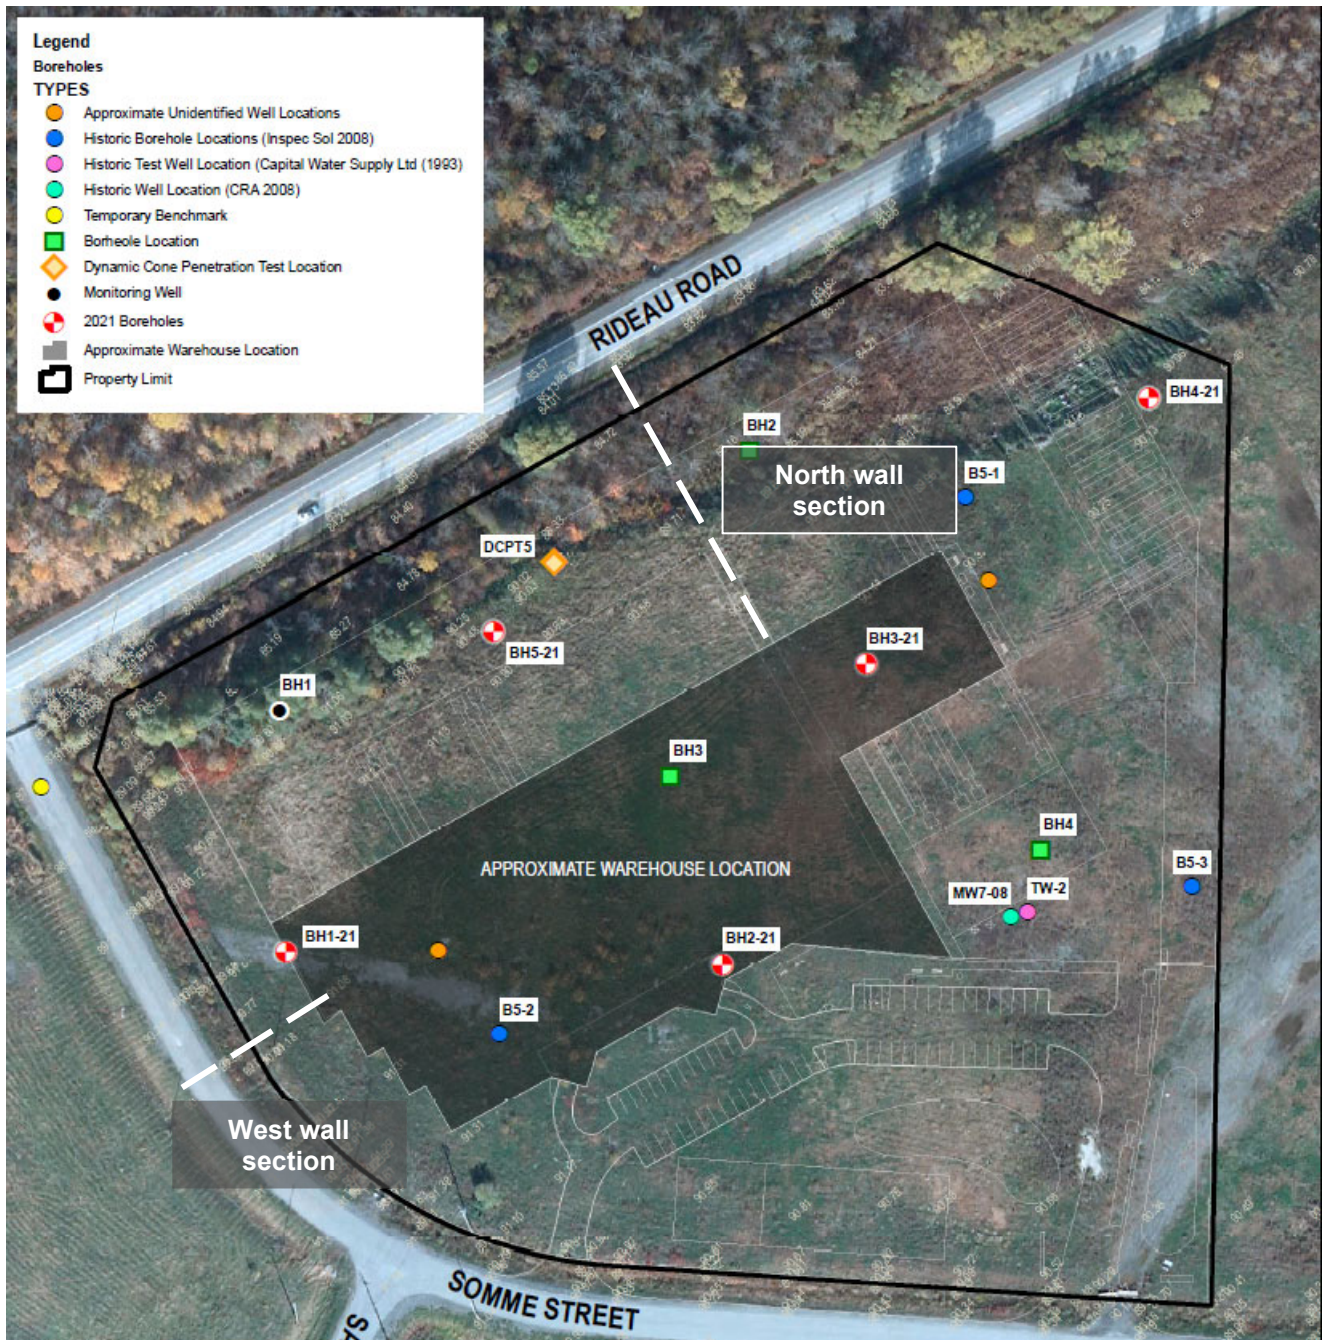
Site Layout showing the location of the analysed cross sections and the proposed building footprint
